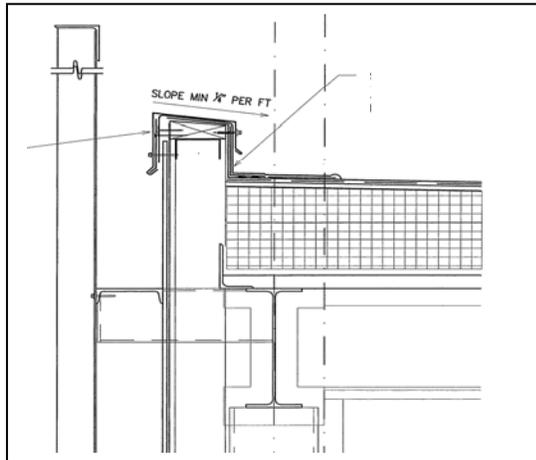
Type E elevated screen parapets yield excellent protection against wind uplift forces, but must be structurally capable of resisting additional loads.
